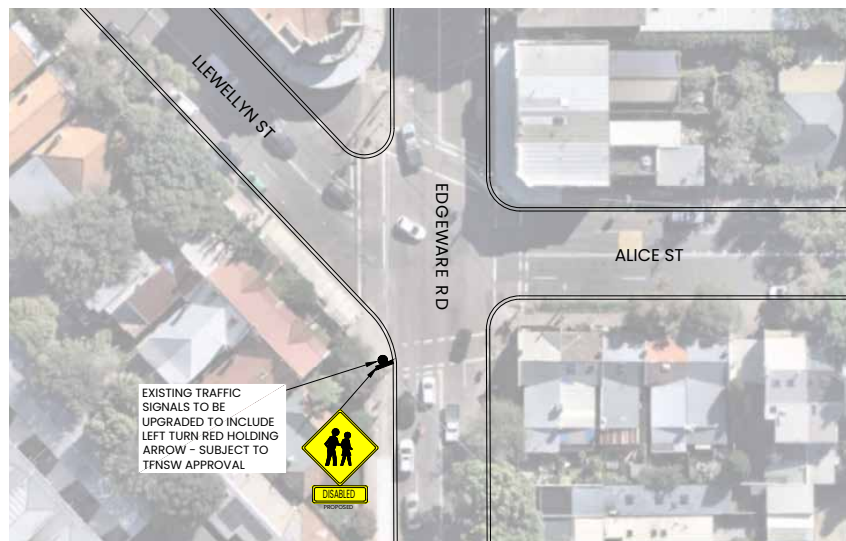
Edgware Road/Llewellyn Street/Alice Street
